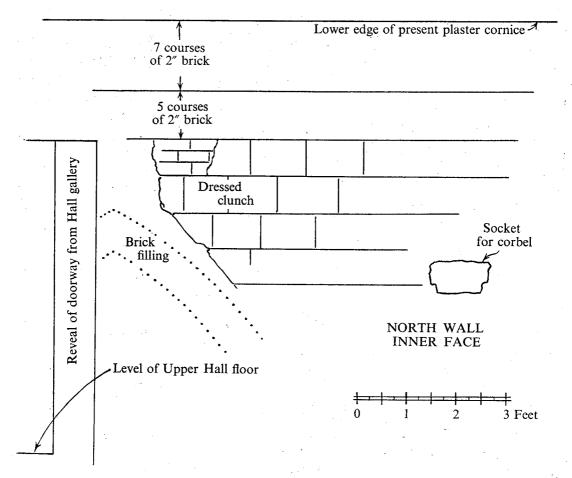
Interior wall face, showing position of corbel in relation to window arch.
